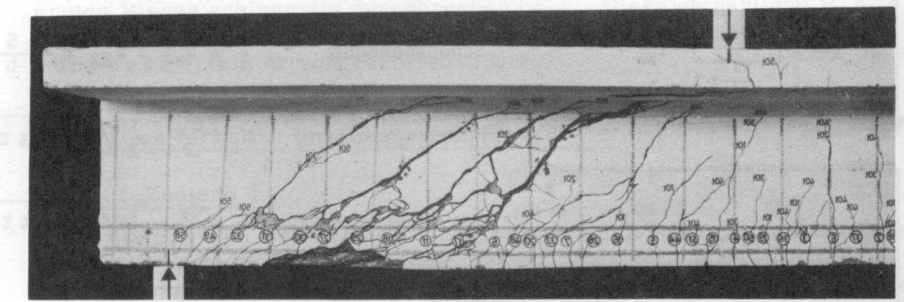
Shear failure of concrete beam as reported by Leonhardt [2,3]
